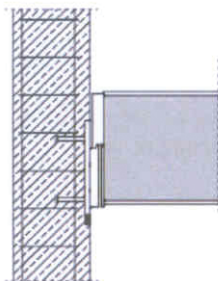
Steel beam connected to concrete wall with anchor plate and shear studs.
